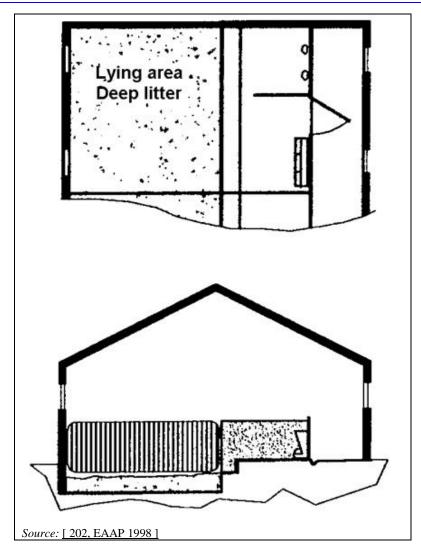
An example of a solid concrete floor system for fattening pigs
